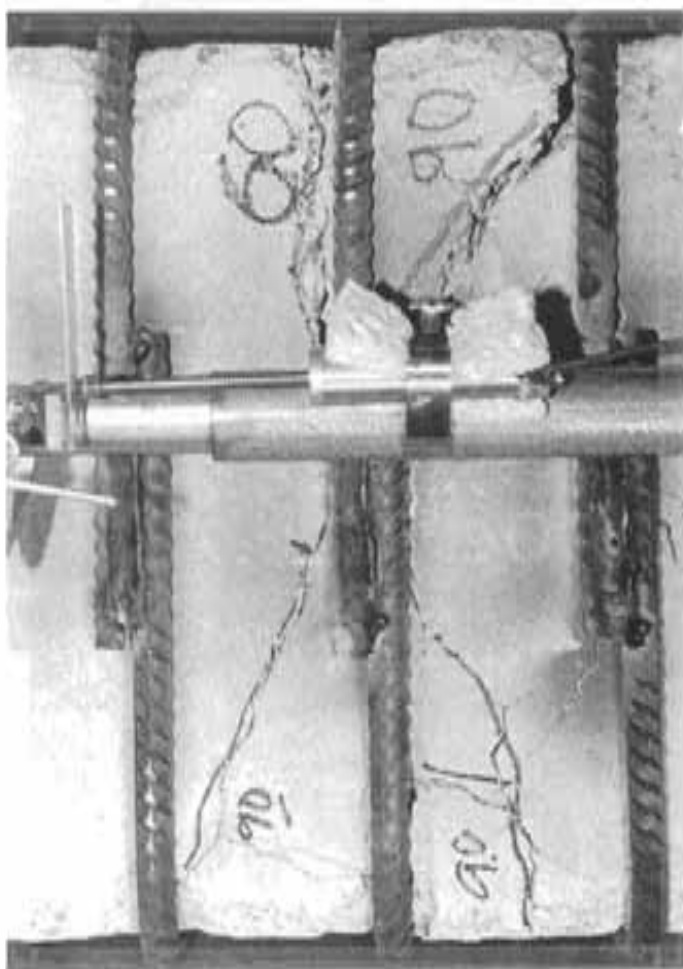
Column specimen U-ES3-UG-2 at failure
